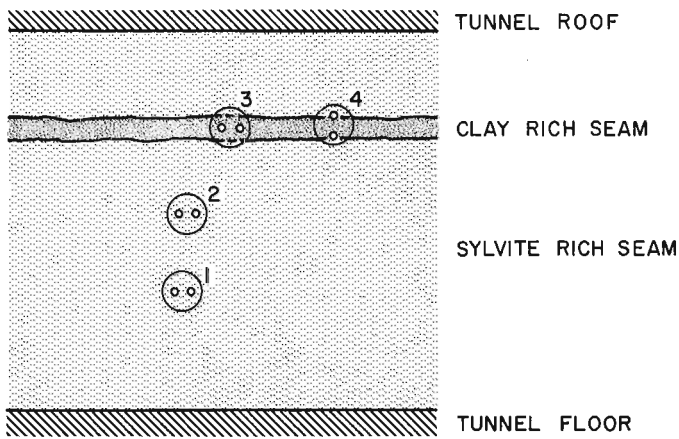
Location of TDR test sites in potash tunnel wall.
